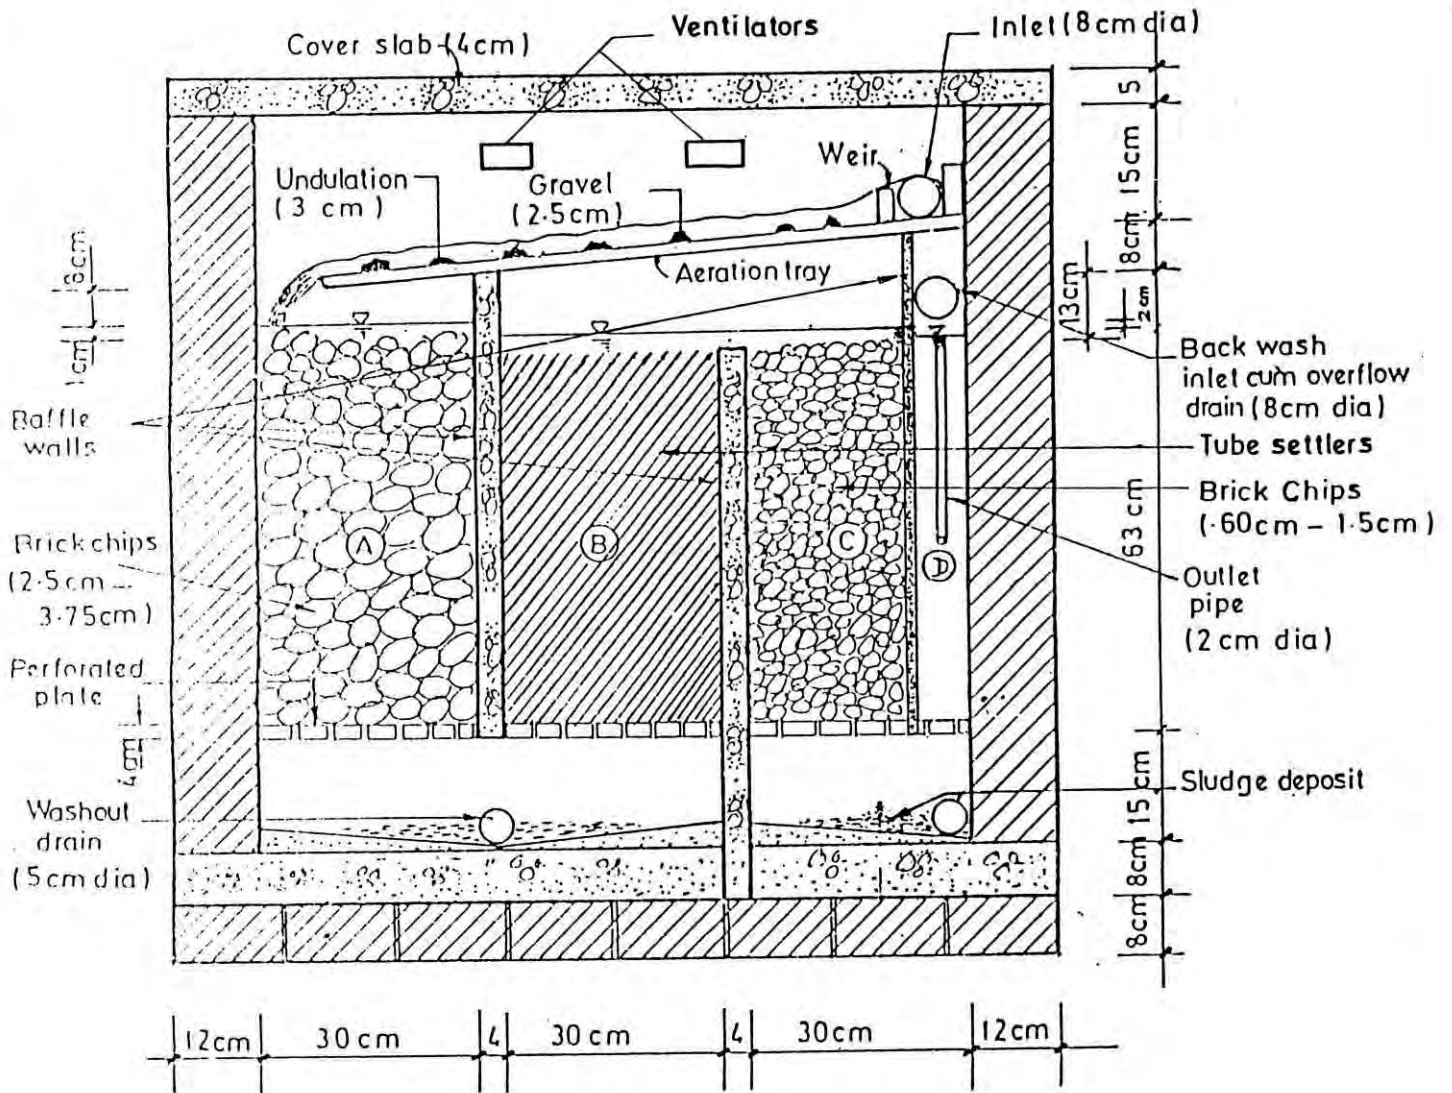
LONGITUDINAL SECTION X-X OF THE MODIFIED PLANT
